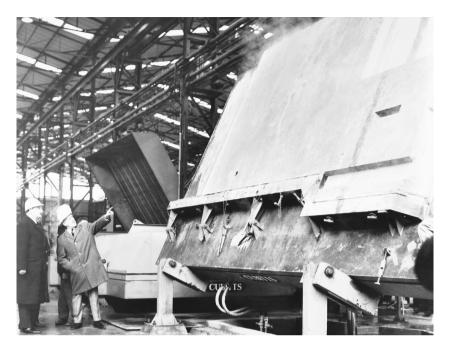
Thamesmead Factory: Mr. Plummer looking at concrete wall of a house, just coming out steaming hot, 1968. London Picture Archive, London Metropolitan Archives, LCC Photograph Library.
